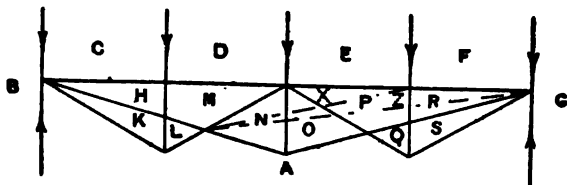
FRAME DIAGRAM, FOR A FINK TRUSS.
